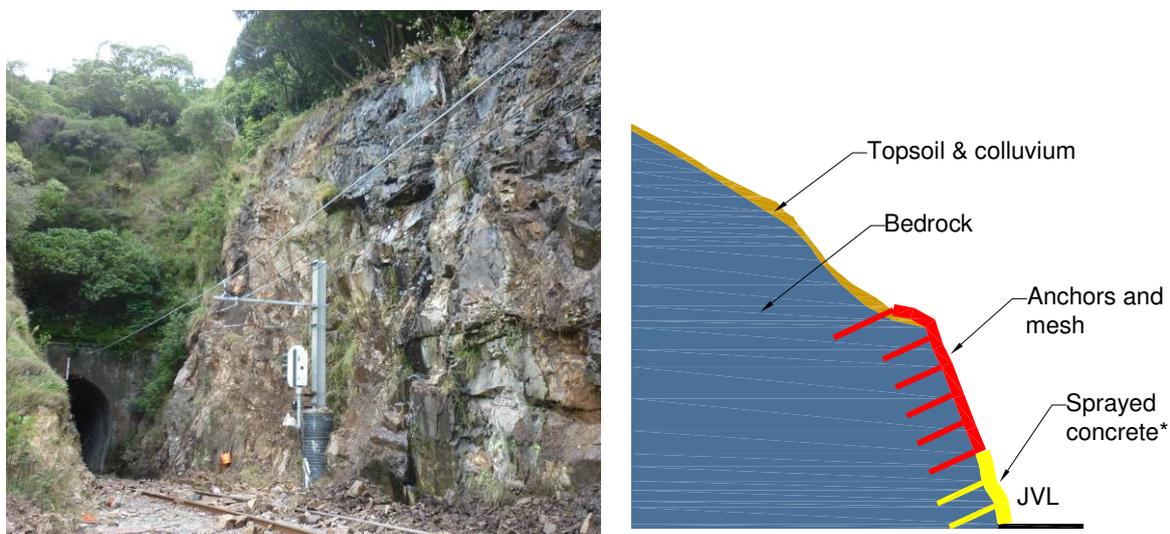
The slope at Tunnel 3 on the JVL: (a) site photograph and (b) schematic cross section.
